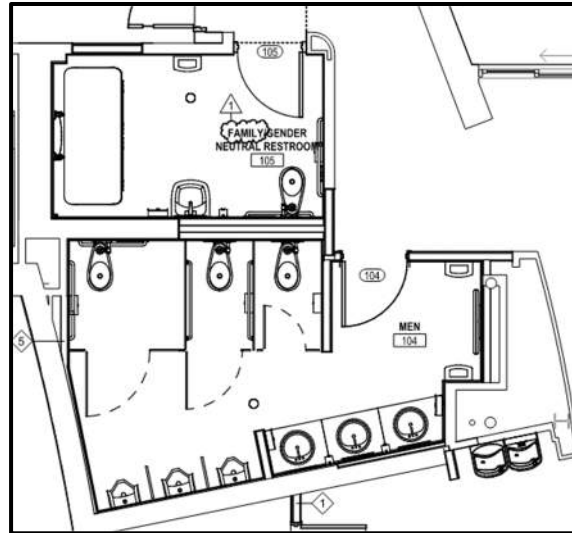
Men's Room & Gender Neutral Restroom Test Fit
